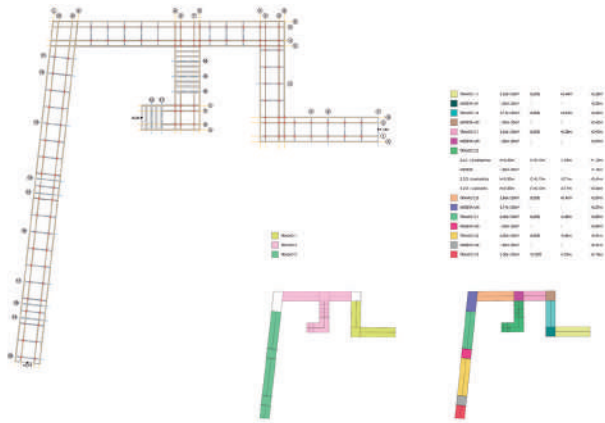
Planimetry. Slopes calc for the accessibility proposal.
